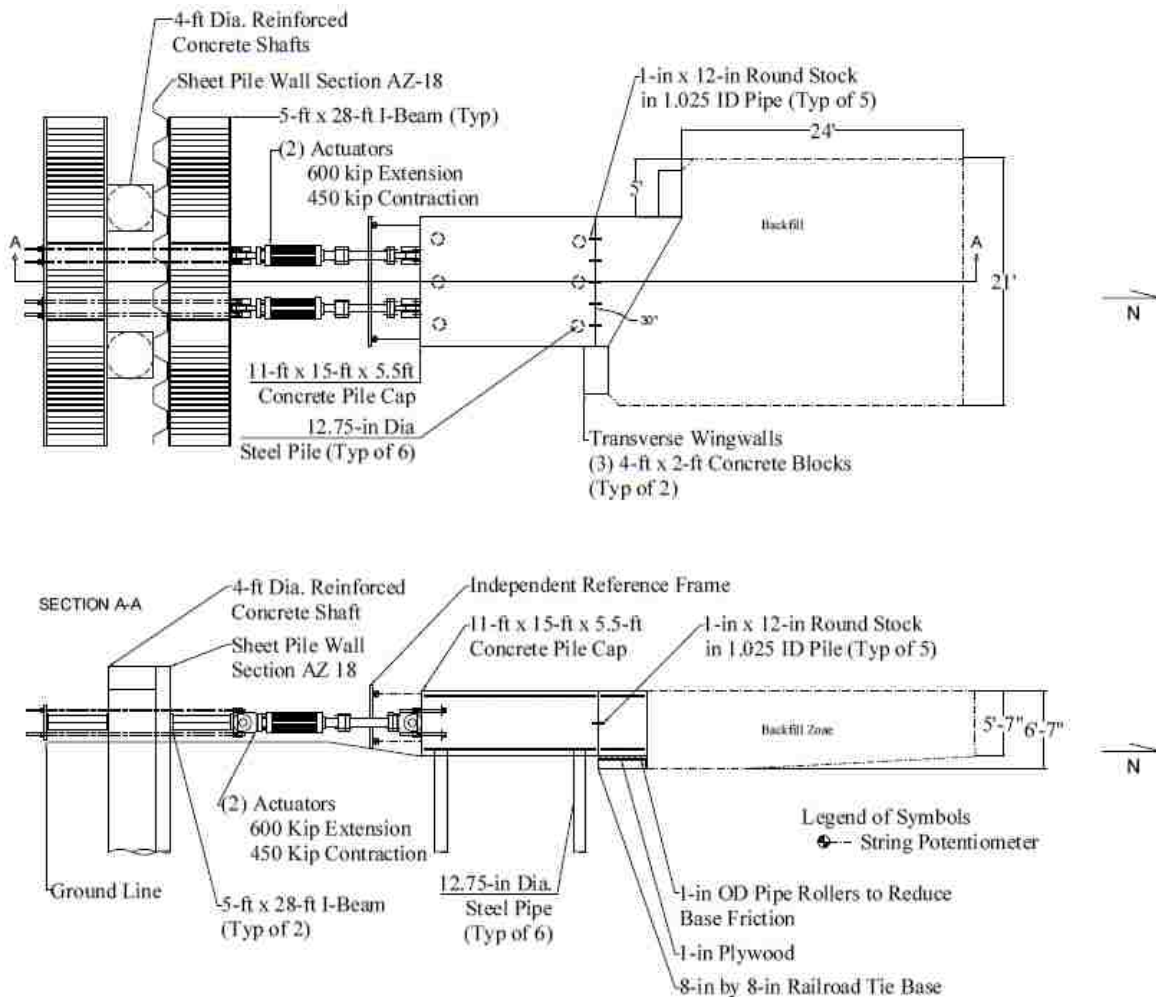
Plan and cross-section views of the general testing layout (Marsh 2013)
